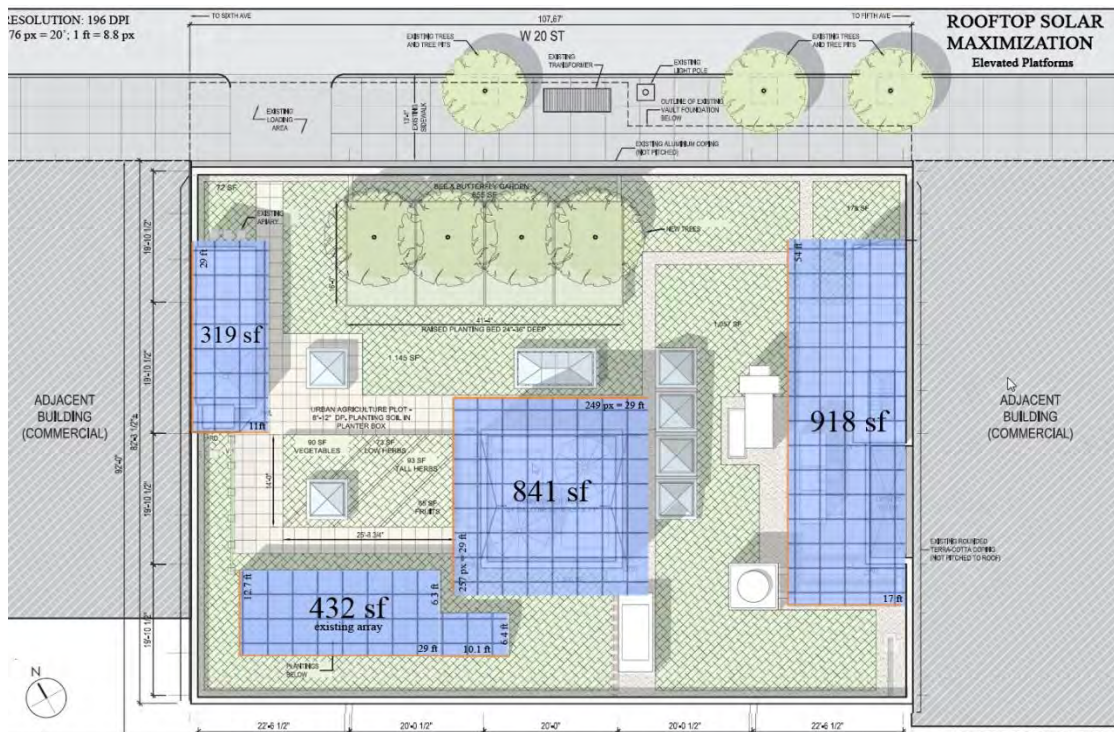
Proposed locations and surface area of elevated platforms on NRDC rooftop
